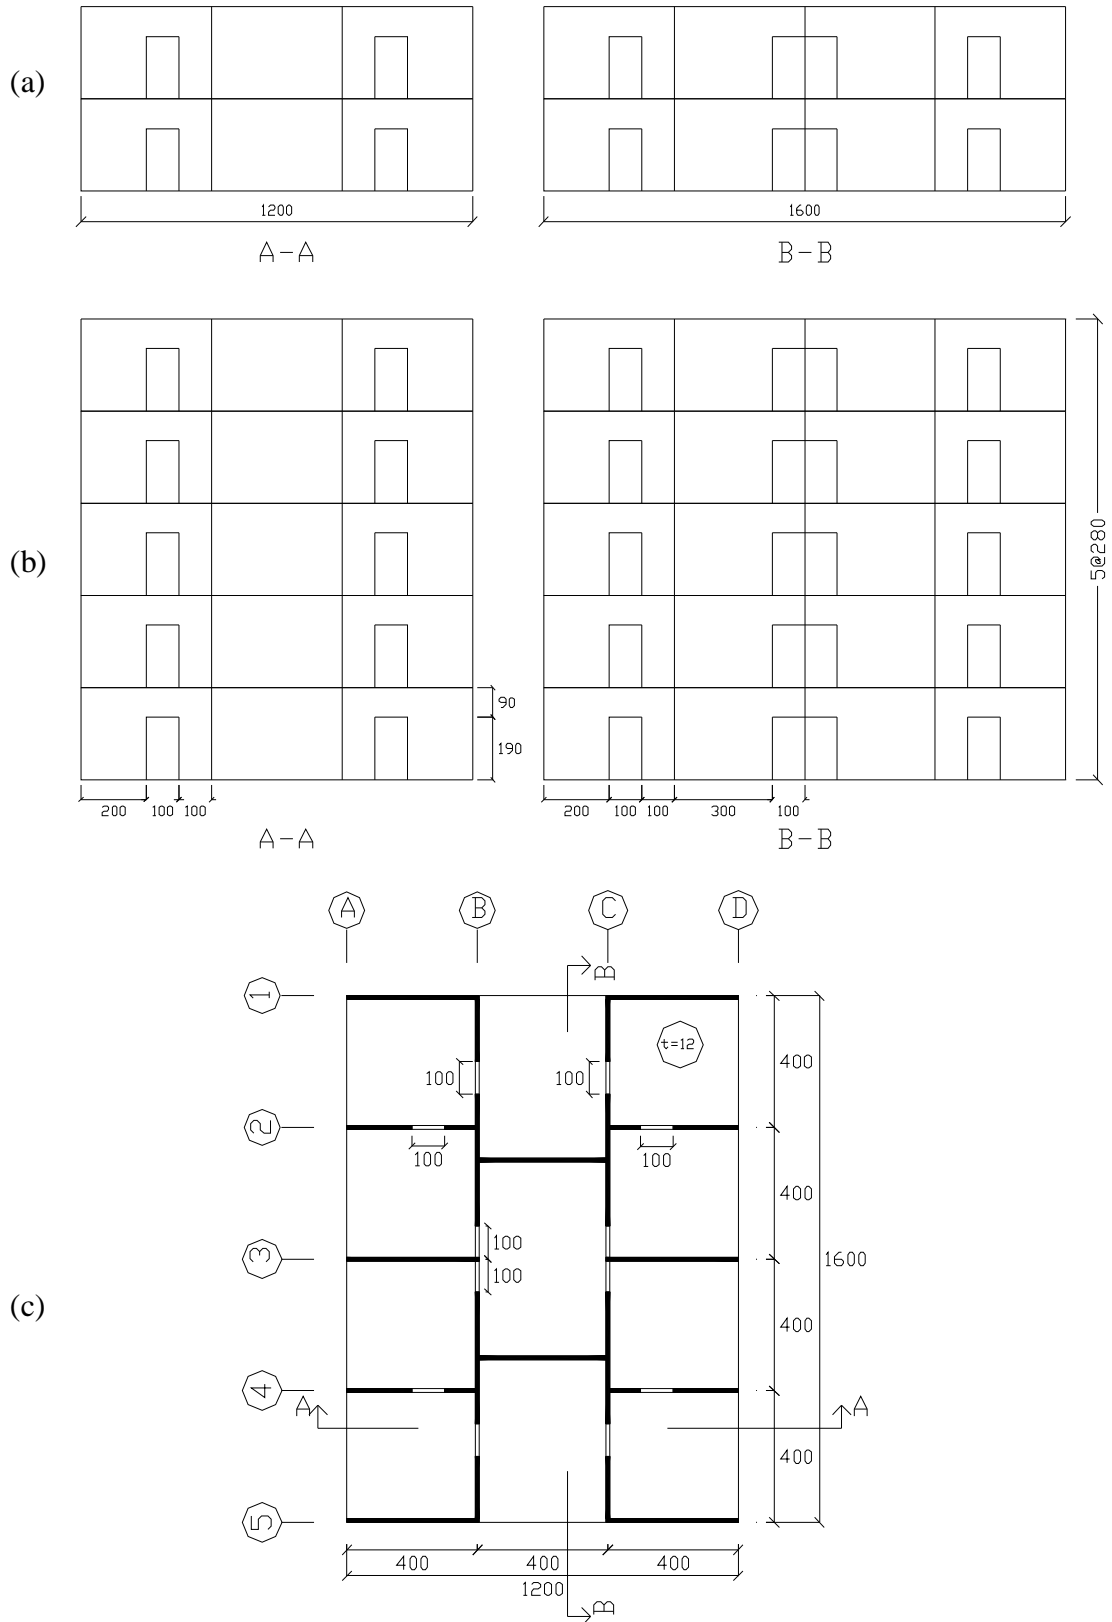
Typical plan and elevations for 2- and 5-story buildings – Plan No. 20 (units in cm). (a) 2-story elevation; (b) 5-story elevation; (c) plan view
